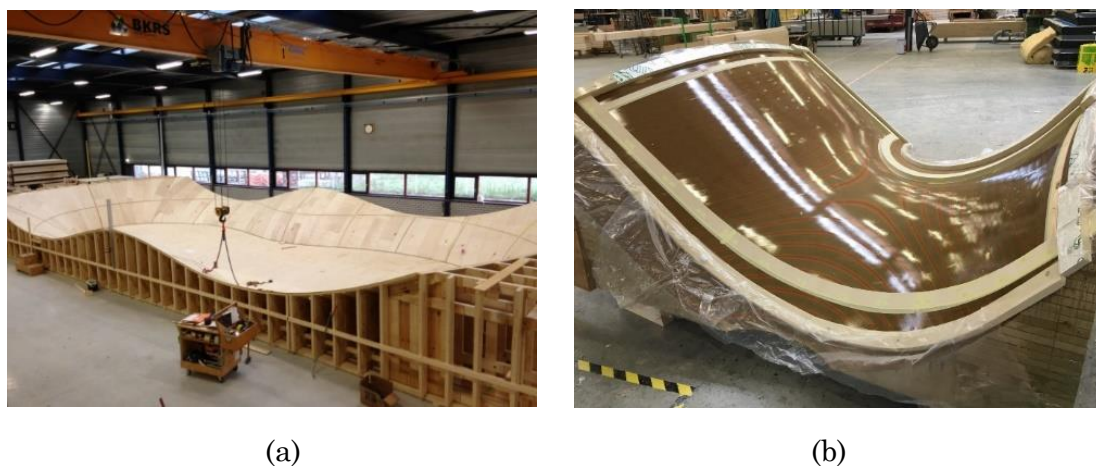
The two types of digitally fabricated timber formworks executed by Verhoeven: (a) the thin plate formwork and additional falsework for The Extended Waalbridge; (b) mould used to fabricate one of the concrete façade elements of The Elizabeth Line (photo credit: (a) Betoniek; (b) Verhoeven).
